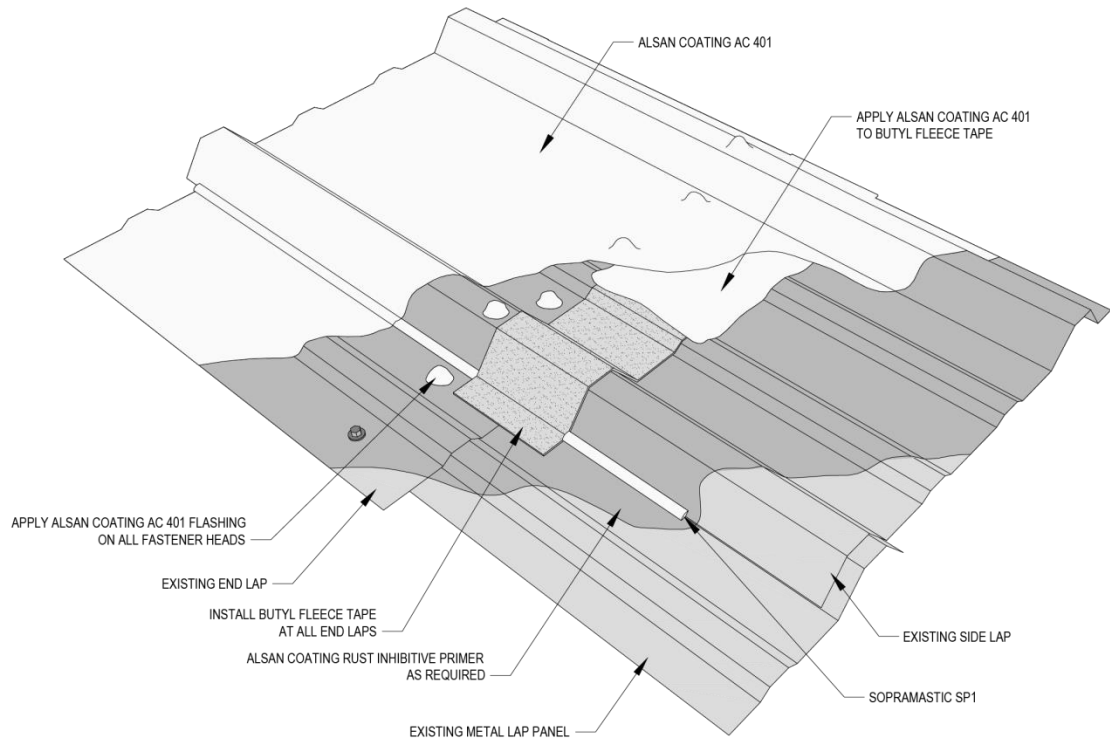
Acrylic Roof Coating Over Metal Lap Panels, Side/End Laps
